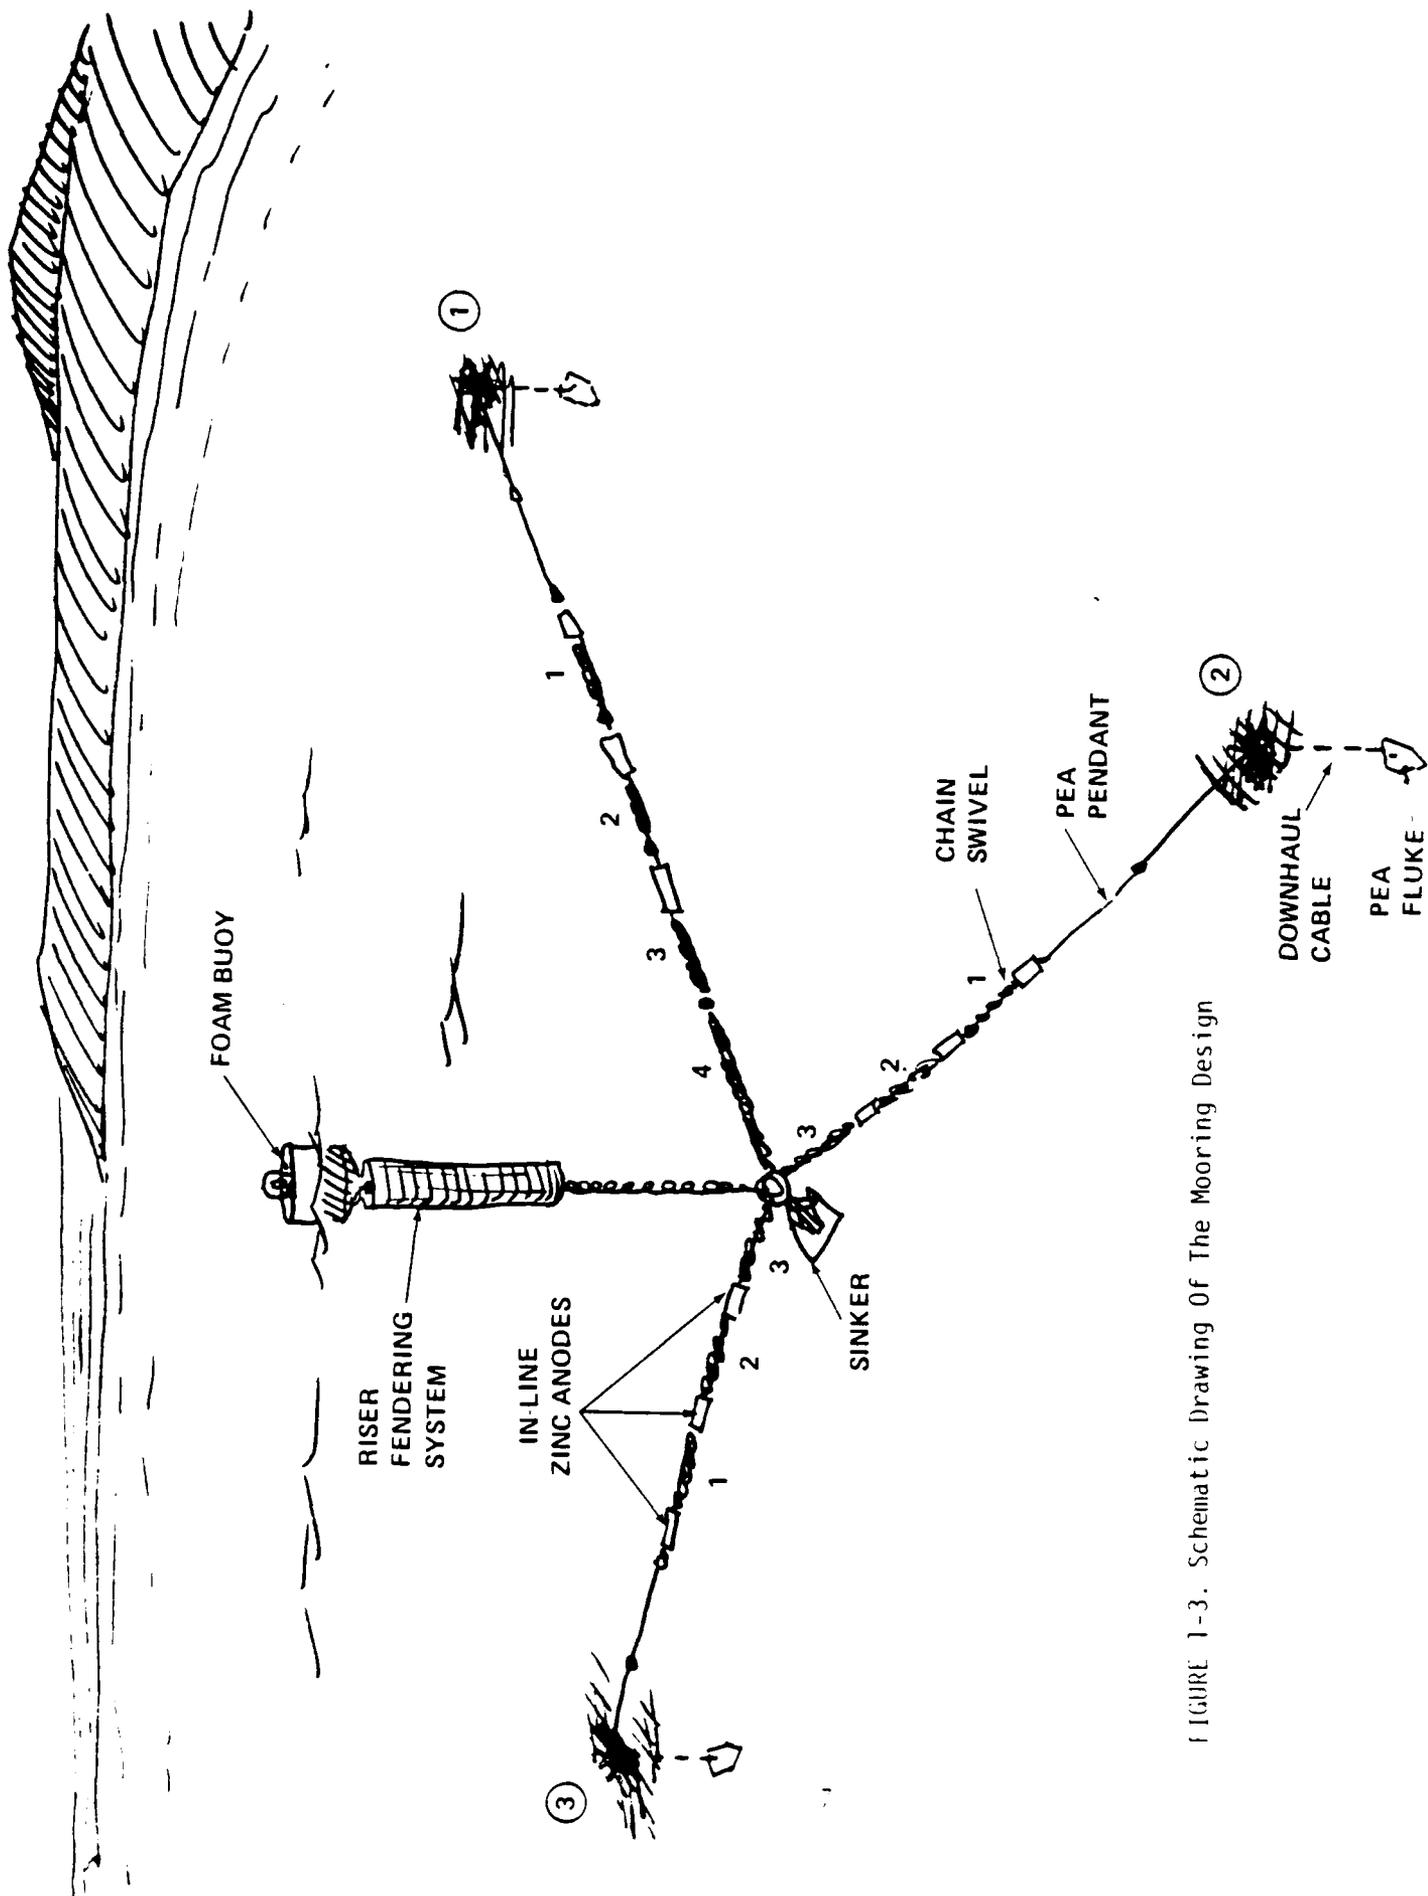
Schematic Drawing Of The Mooring Design
